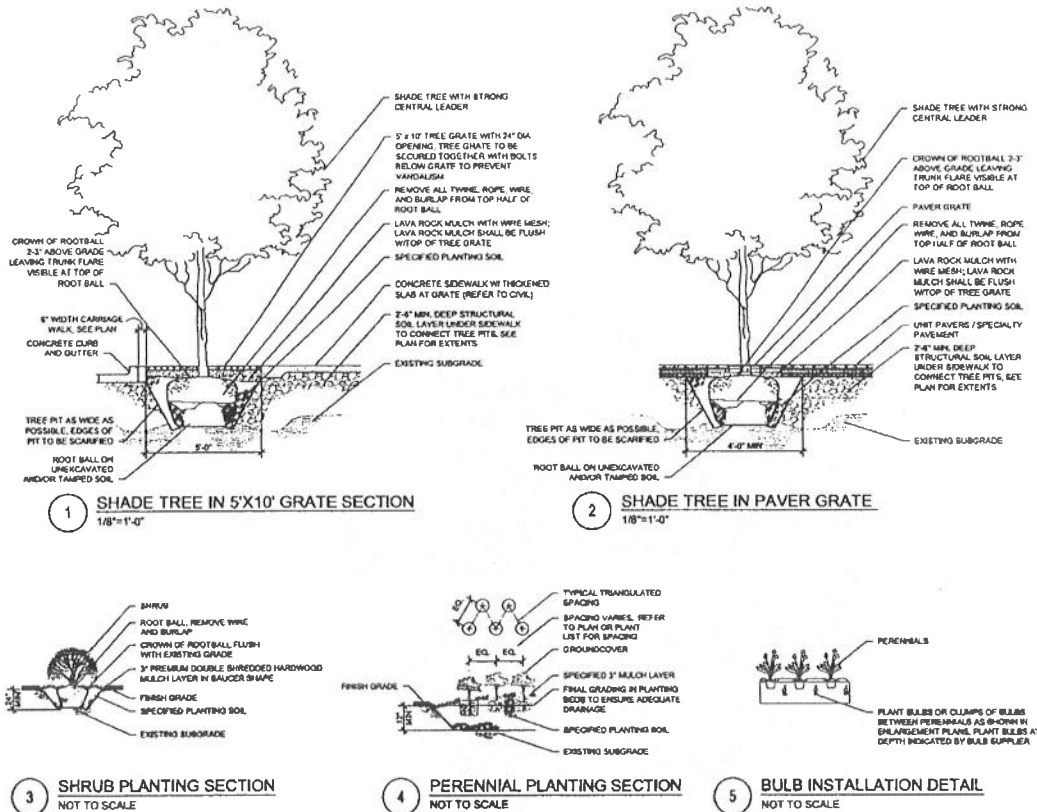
A: SITE AND LANDSCAPE PLAN
